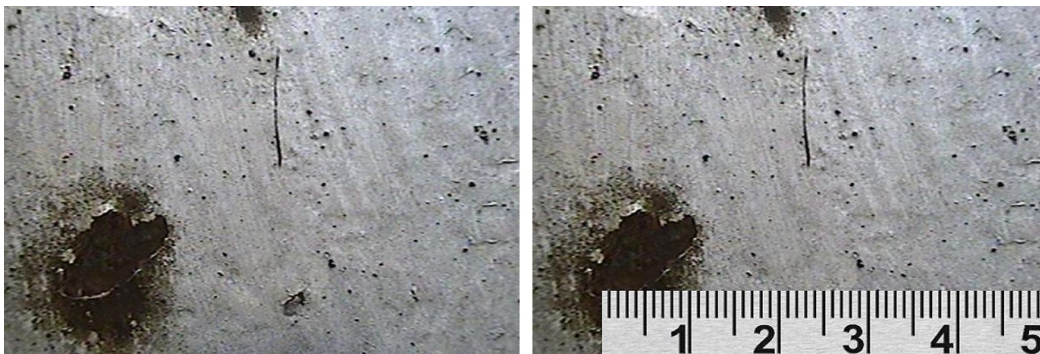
Image taken by the visual inspection camera at vertical member of truss in existing bridge
